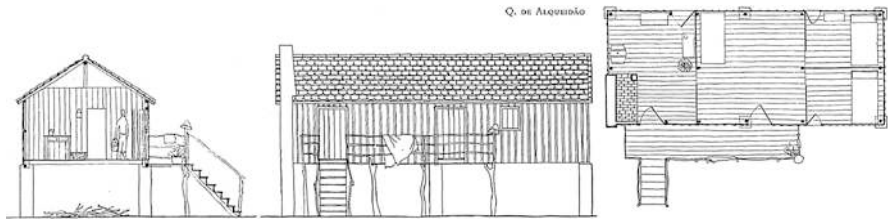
Typical palaphitic house in the Tejo river (source: AAP 1961)
